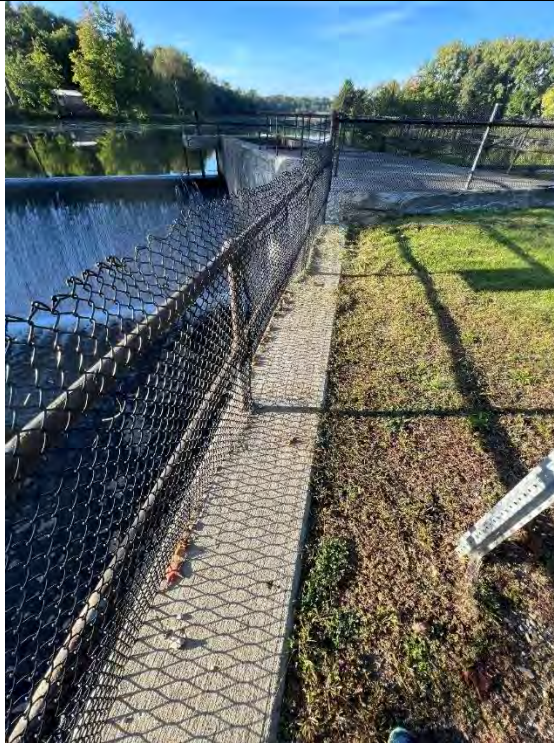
Top of Downstream Left Wall Upstream of M-52 Bridge Looking Upstream
